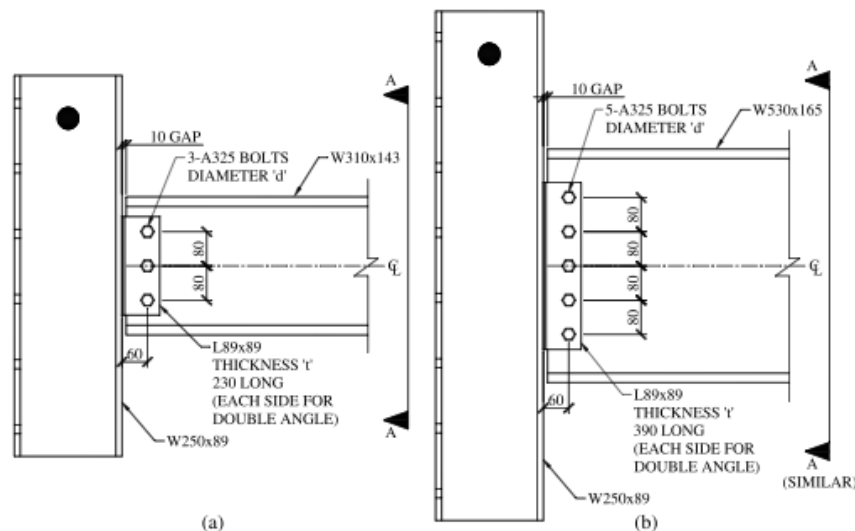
Testing configuration for double angle specimens (Oosterhof & Driver, 2015).
